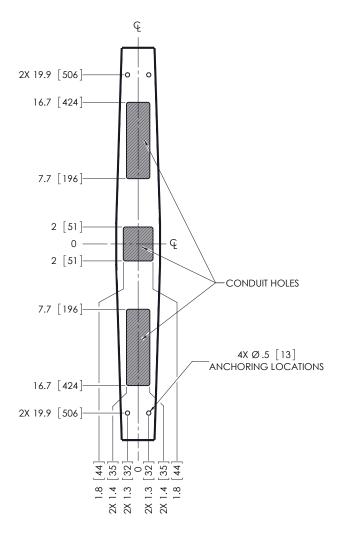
28" Single Lane - Plan, Elevation & Footprint Drawing
